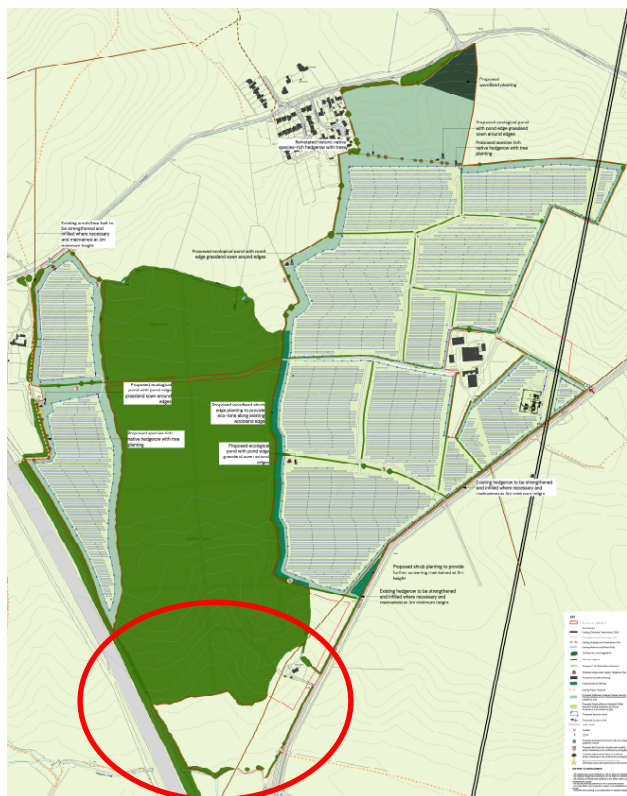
Amended proposed site layout (with area south of Oakley Wood removed):
